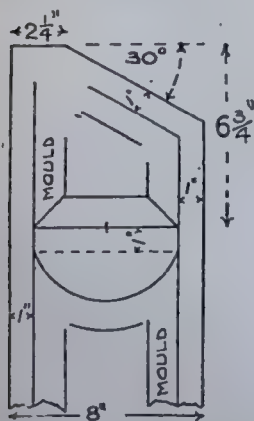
FRAME, WITH FULL-SIZE SECTION OF MOULDING.
